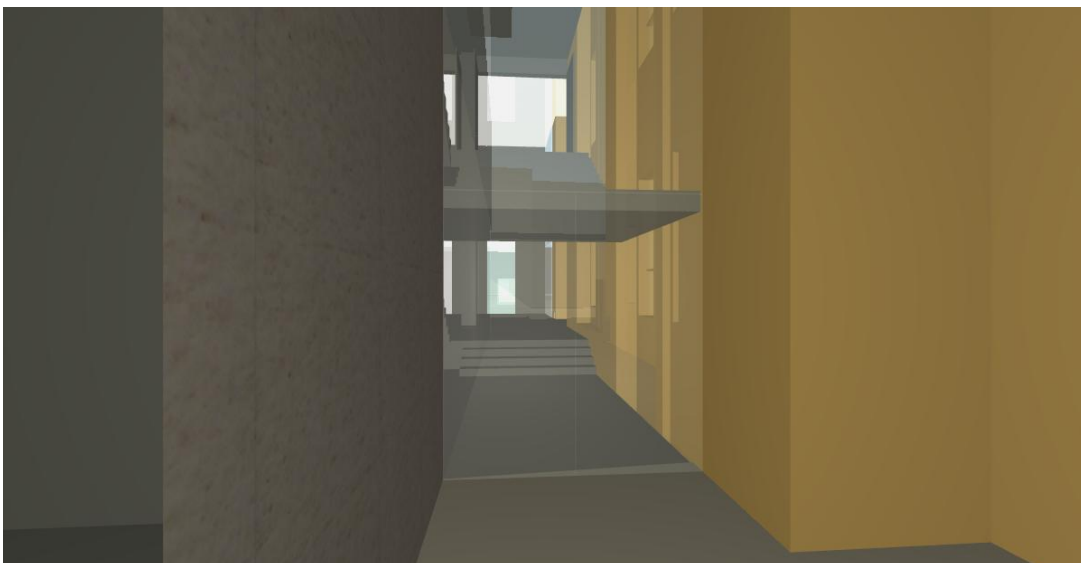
Detail of connection between existing and proposed building, looking from George Street
